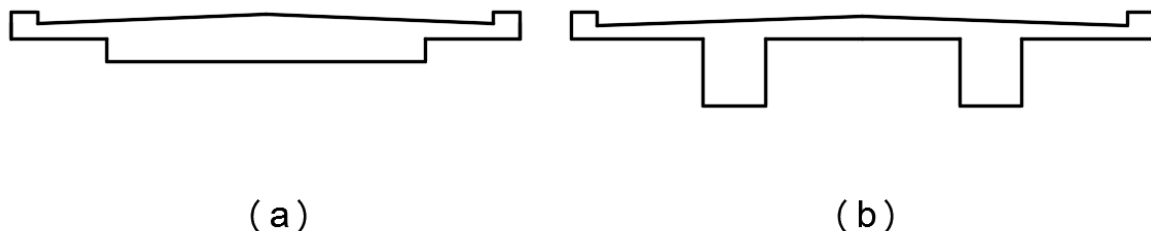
Typical executions of cross sections of (a) a slab bridge and (b) a slab-and-beam bridge.
